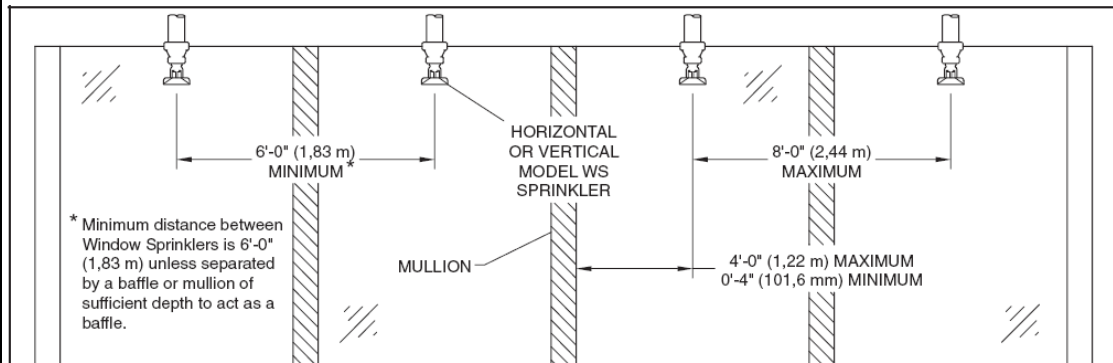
A-3 — EXTERIOR FIRE SEPARATION — SPRINKLERS OUTSIDE
